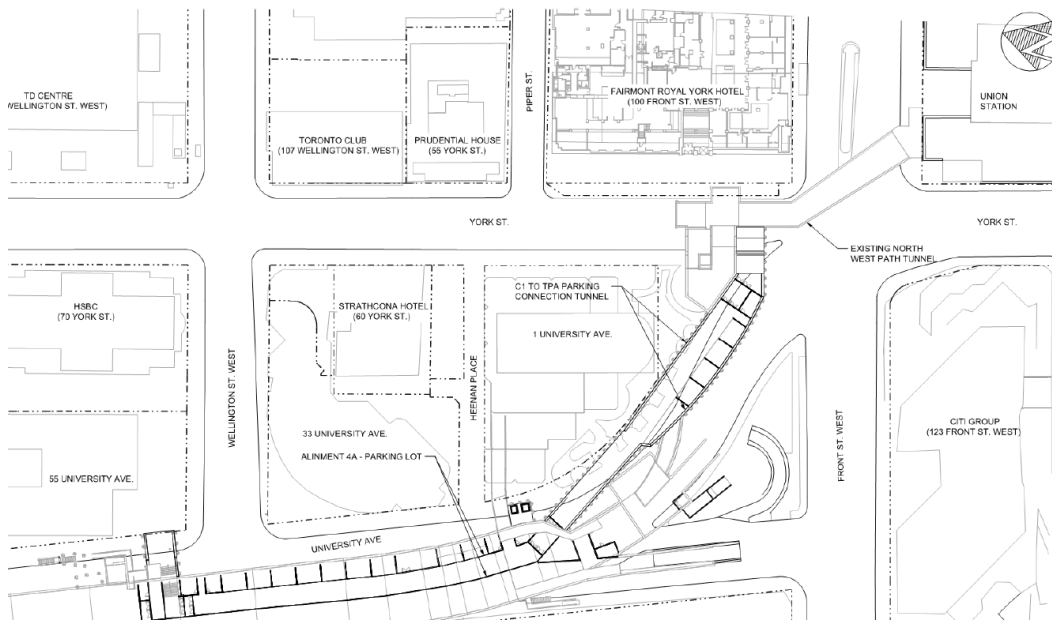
Alignment 4 plan-view. Image courtesy of Hatch
